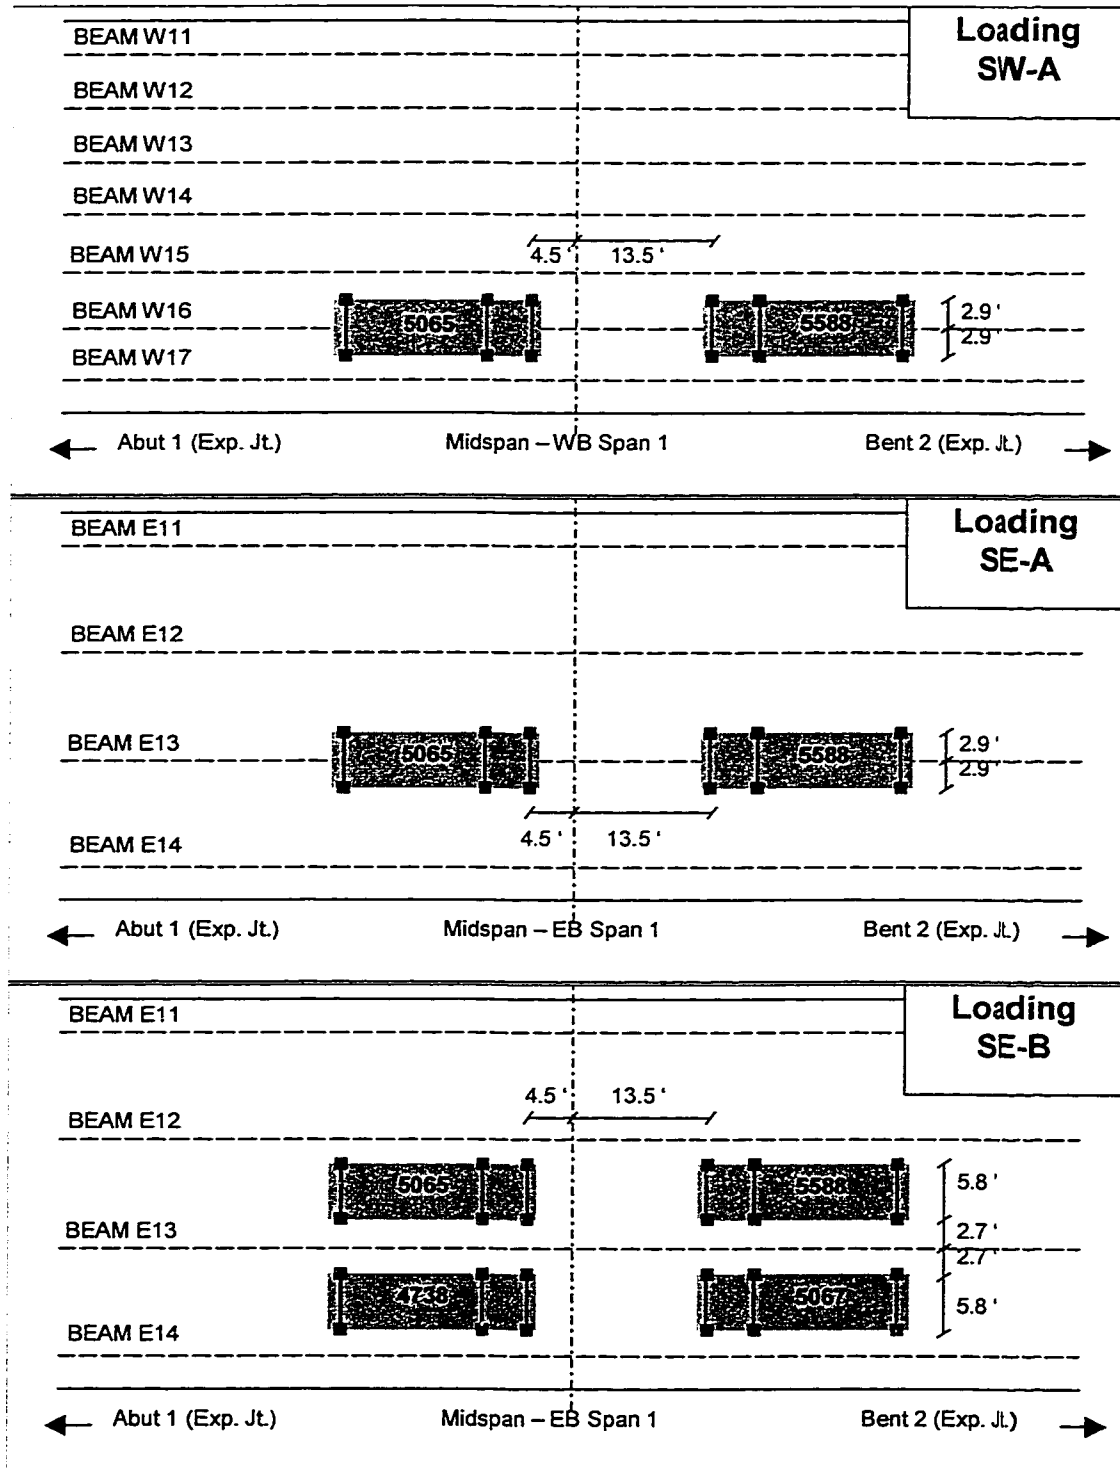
Loading Arrangements for San Angelo Live Load Tests
